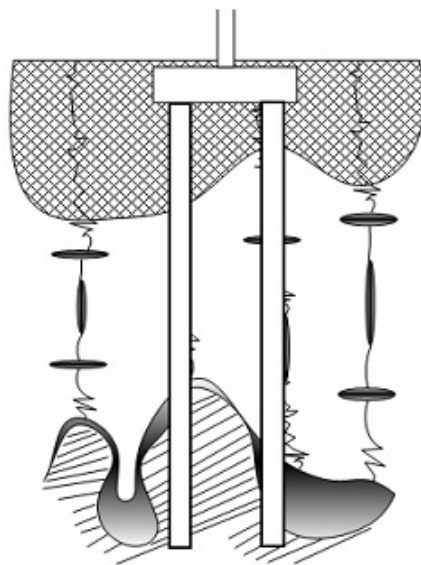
Piles to bedrock (<http://www.gautrain.co.za>)
